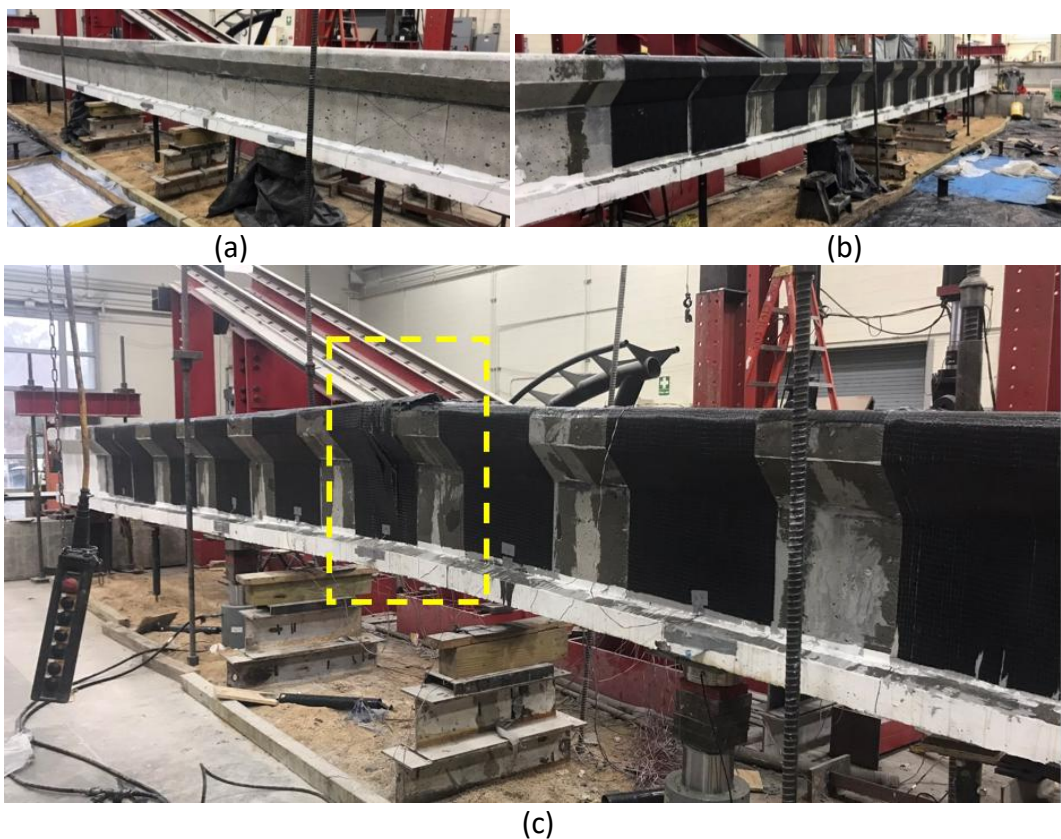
(a) Surface preparation, (b) CFRP curing, (c) Failure of the girder
